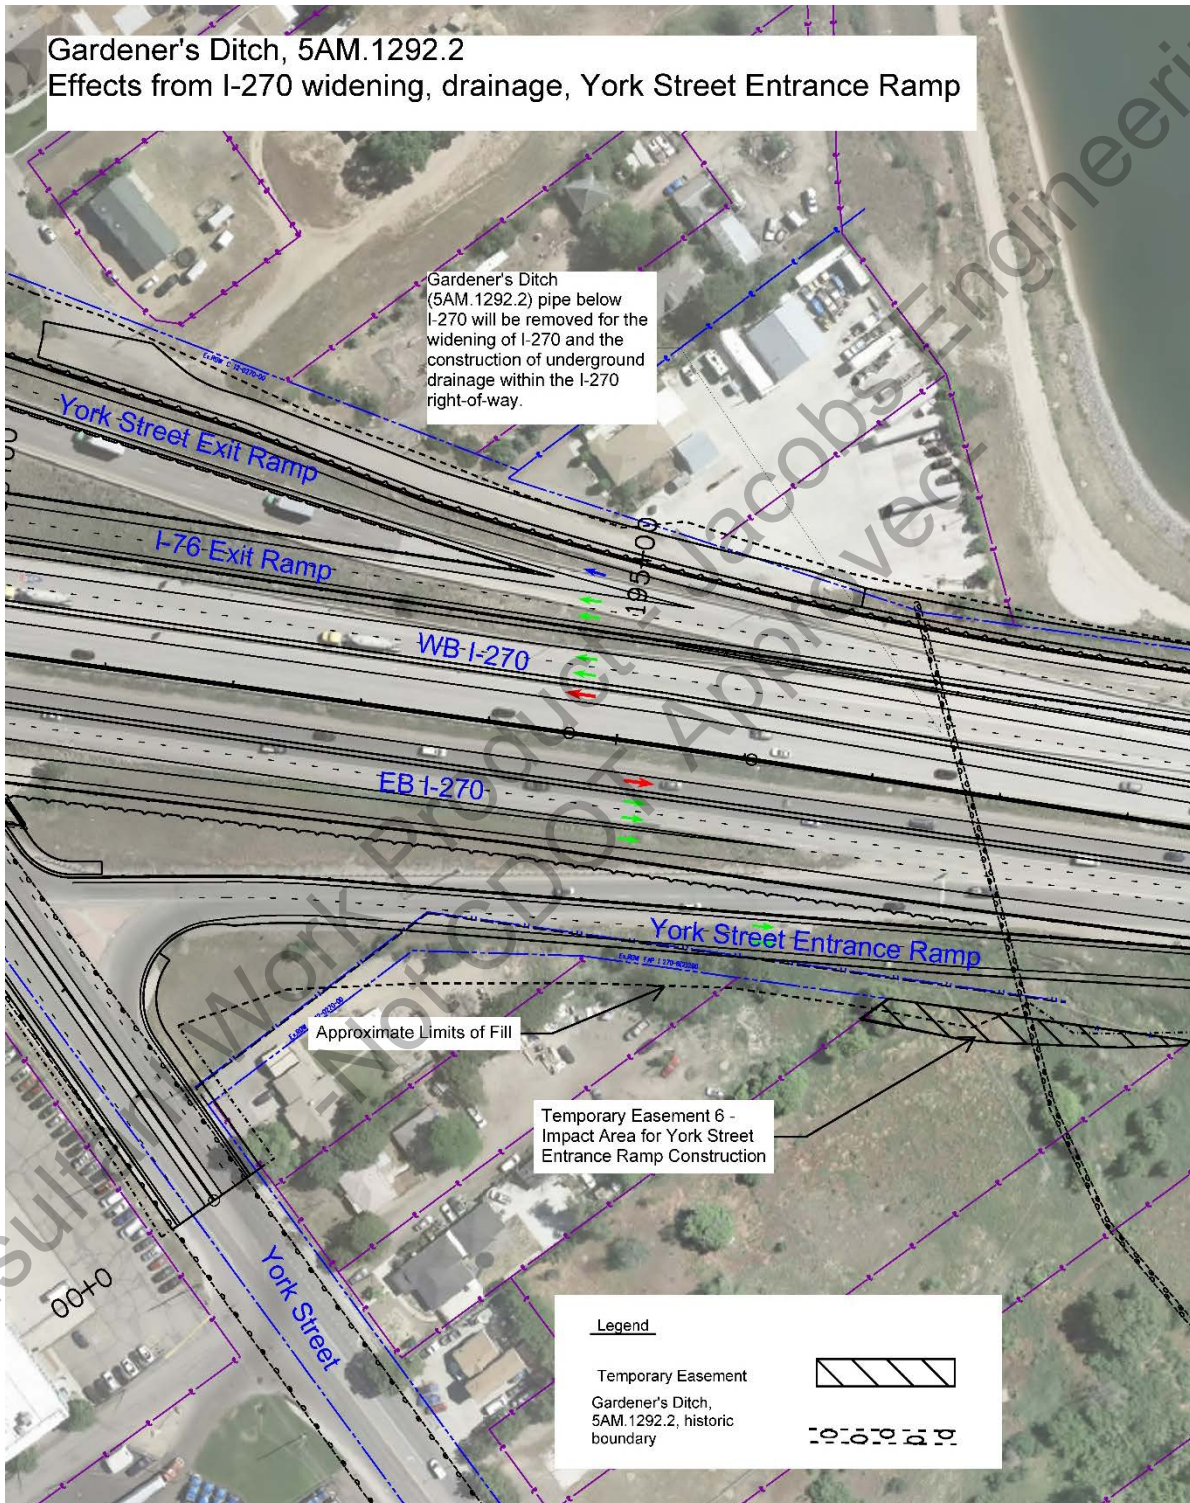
Effects of the project on the Gardener's Ditch segment 5AM.1292.2.
